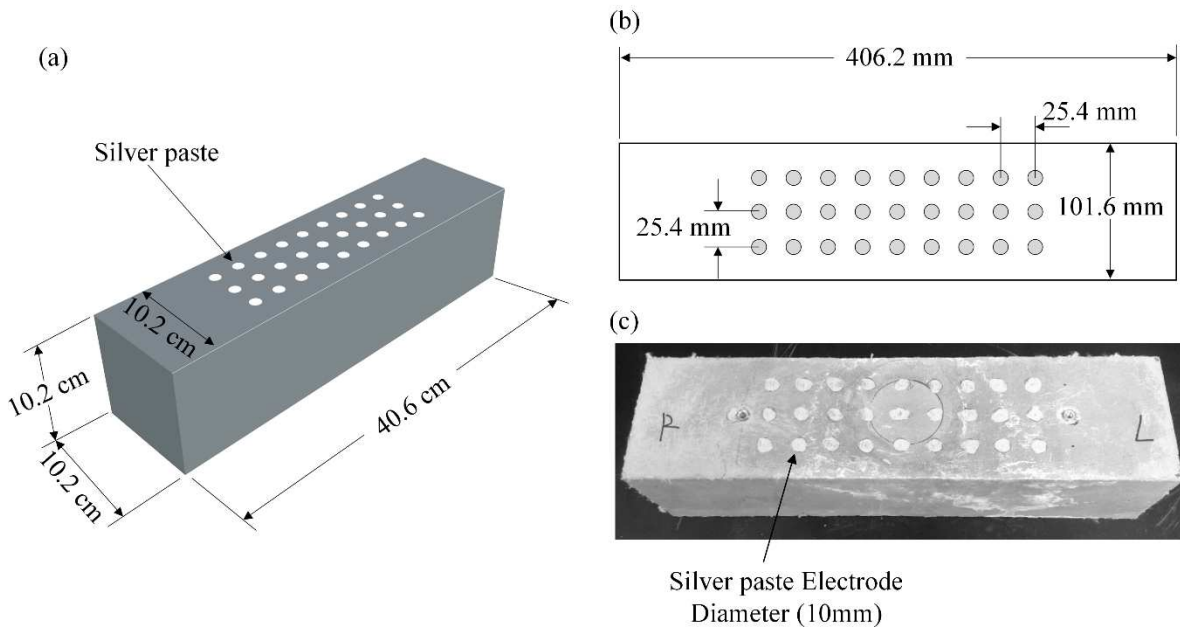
Beam specimen with 24 electrodes on one single side: (a) beam specimen illustration; (b) electrode setup; (c) one beam specimen
